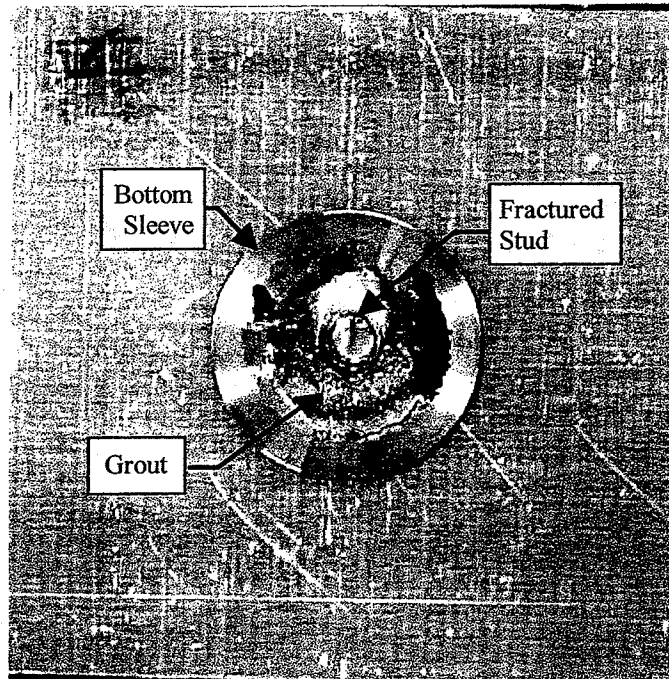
Typical View of Bottom Face Sheet of Grouted Specimen After Testing
